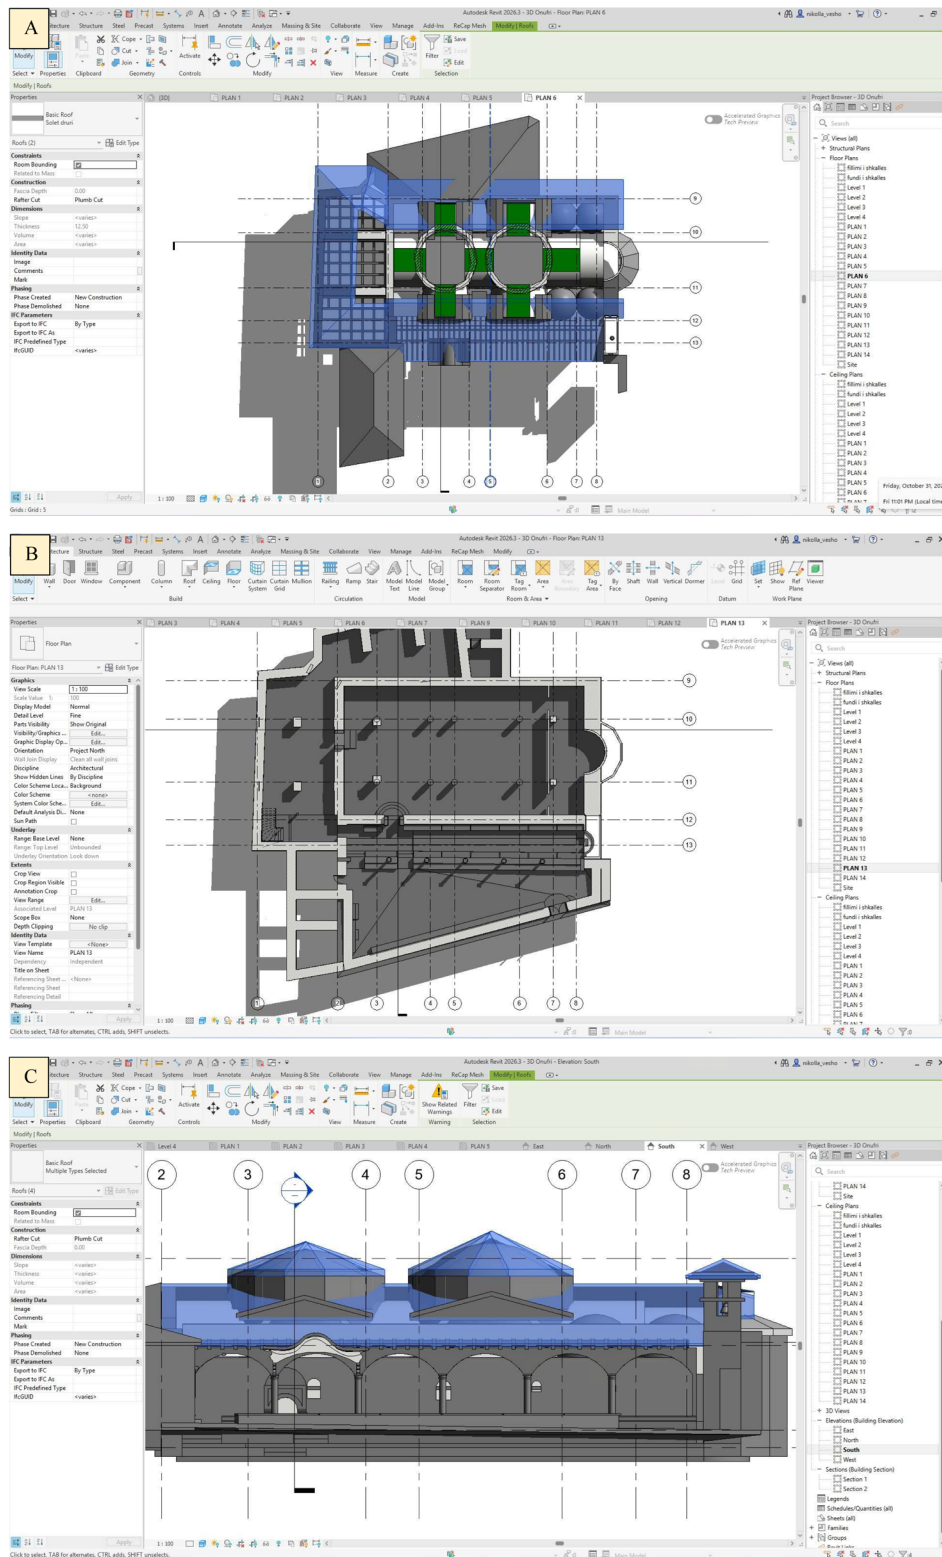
Detailed building information modeling (BIM) in Autodesk Revit. (A) Geometric reconstruction of the roof structure derived from FJD Trion point-cloud data. (B) Extraction of the floor plan at +1.5 m level and structural layout analysis within the BIM environment. (C) Generation of the principal façade and portico elements through parametric modeling and elevation development in Autodesk Revit.
